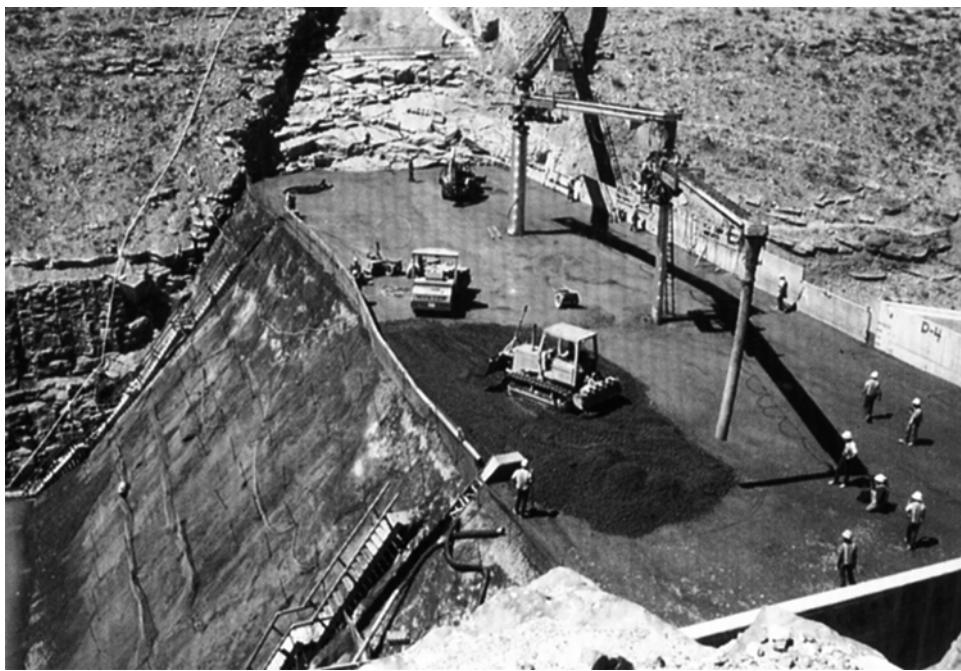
All-conveyor RCC placing with embedded steel columns and “swinger” conveyor.
